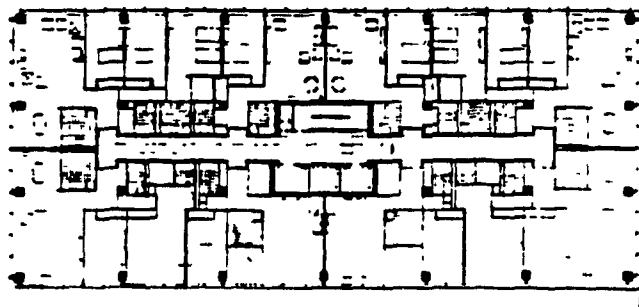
Plan of Hotel typical floor, La Cite, Montreal.
